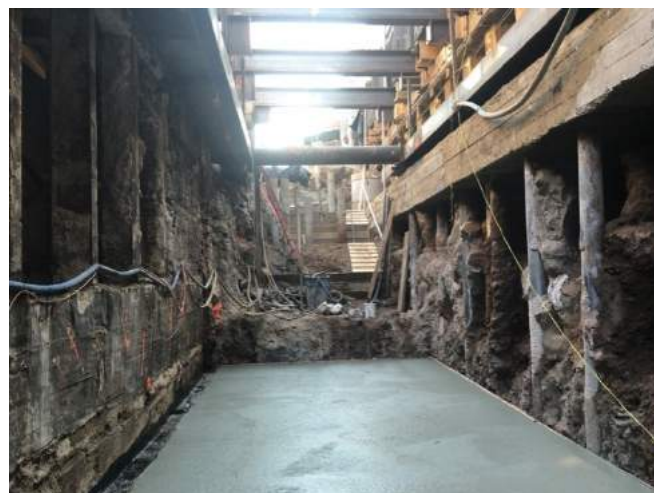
Urban excavation abutting existing tunnel (left) and other structures.
